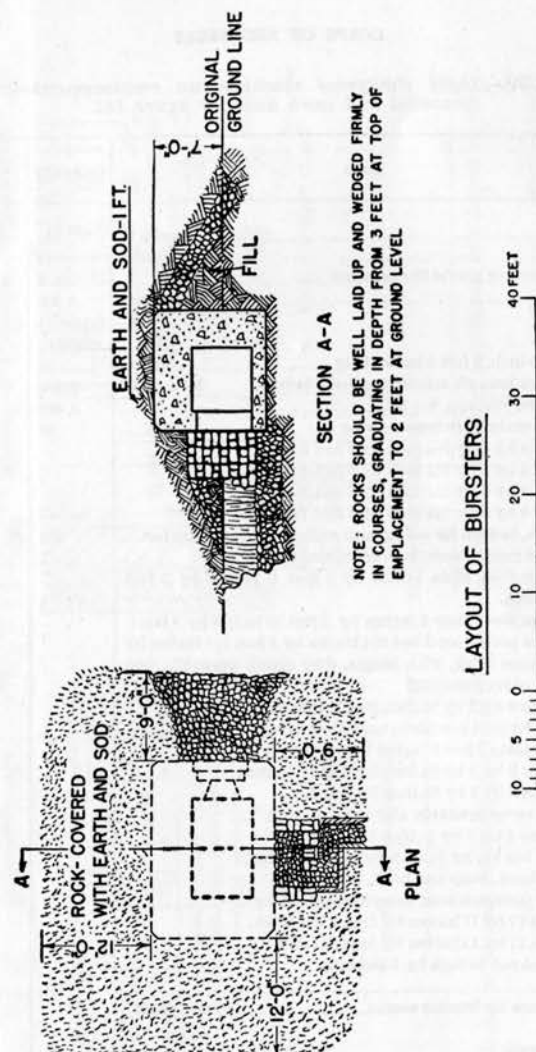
Light shellproof machine-gun emplacement (lay-out of bursters).
